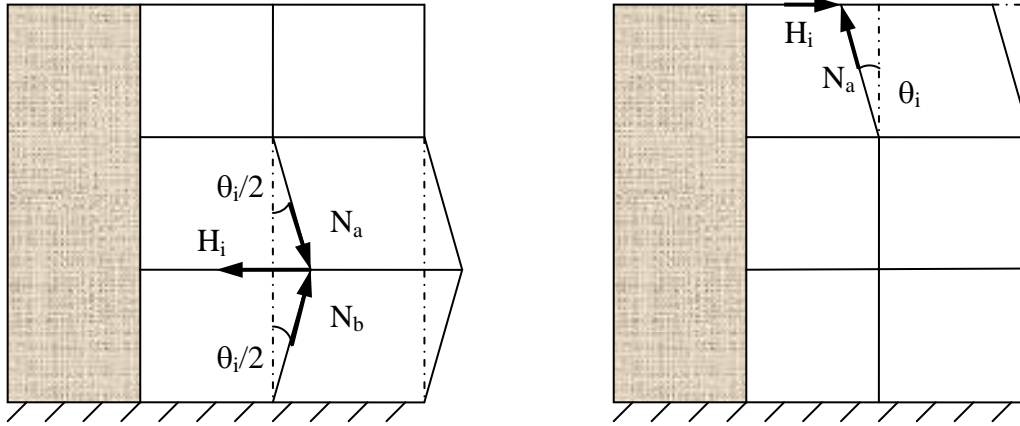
Geometrical imperfection on a braced structure
